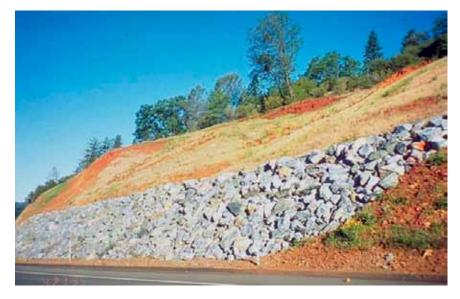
A drained rock buttress used to stabilize a cutslope failure.
